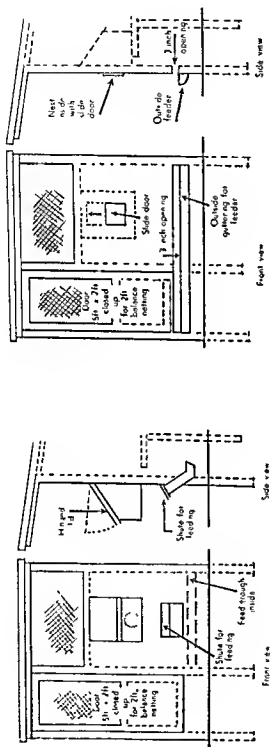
Small pens, 8 ft x 6 ft, as intensive units for 12 birds (up to 16 if adapted as Dryden unit). Some alternative arrangements are shown. The nest can be placed outside when sufficient roof overhang in front is provided, but the inside location is used when this is reduced, to avoid sunshine on the nest in hot weather.
